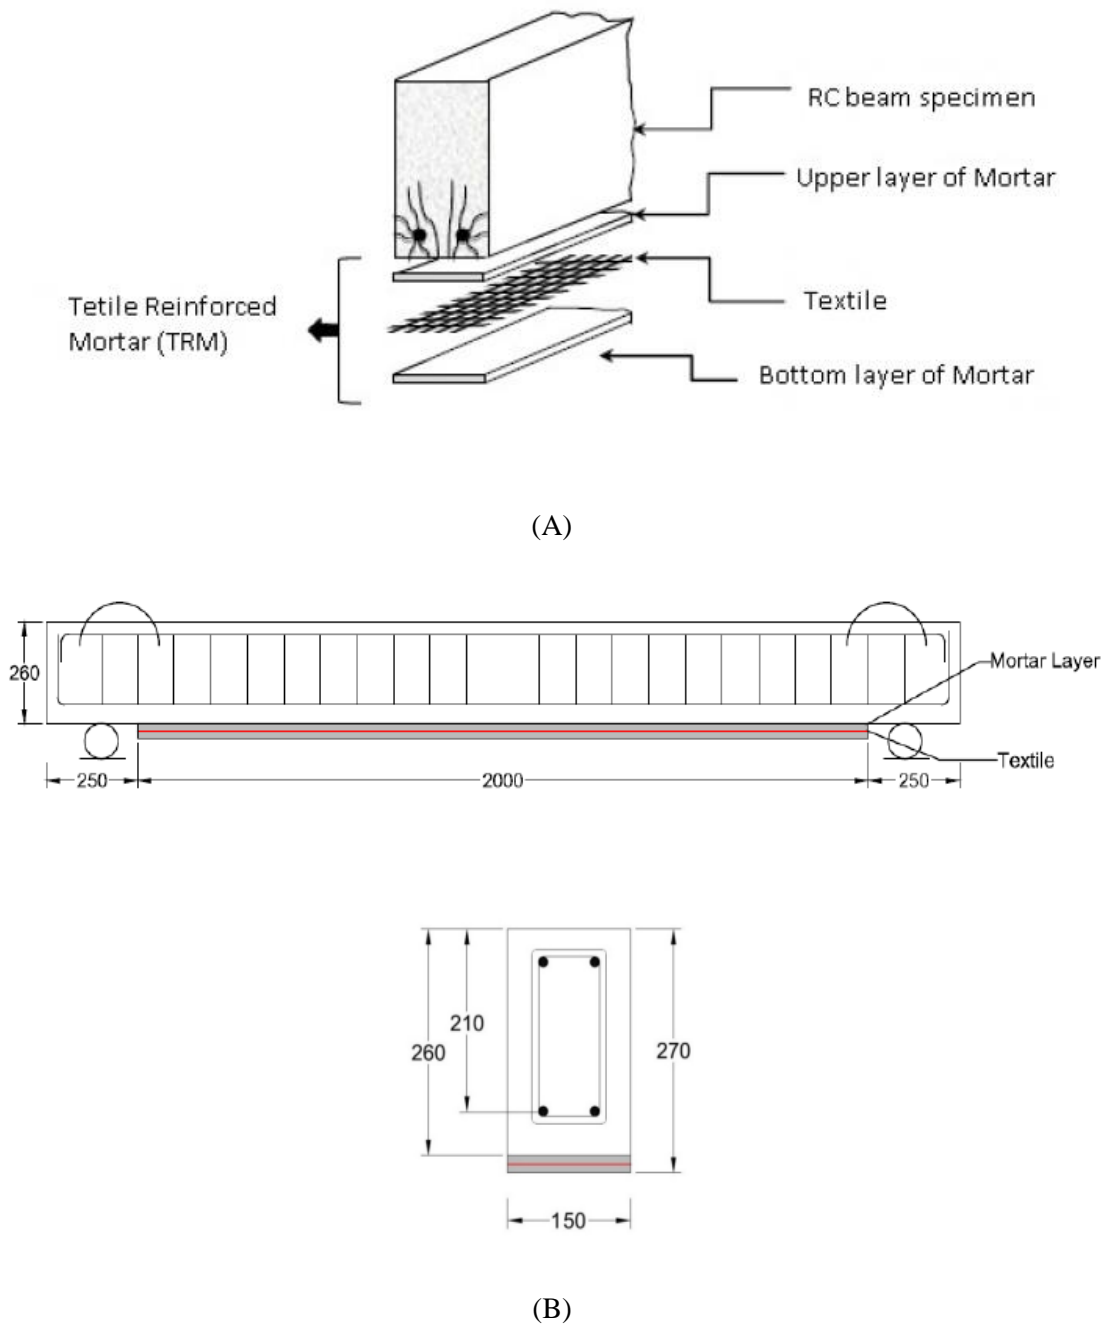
Longitudinal and mid span cross-section of strengthened specimen. (Afzal, 2016)
